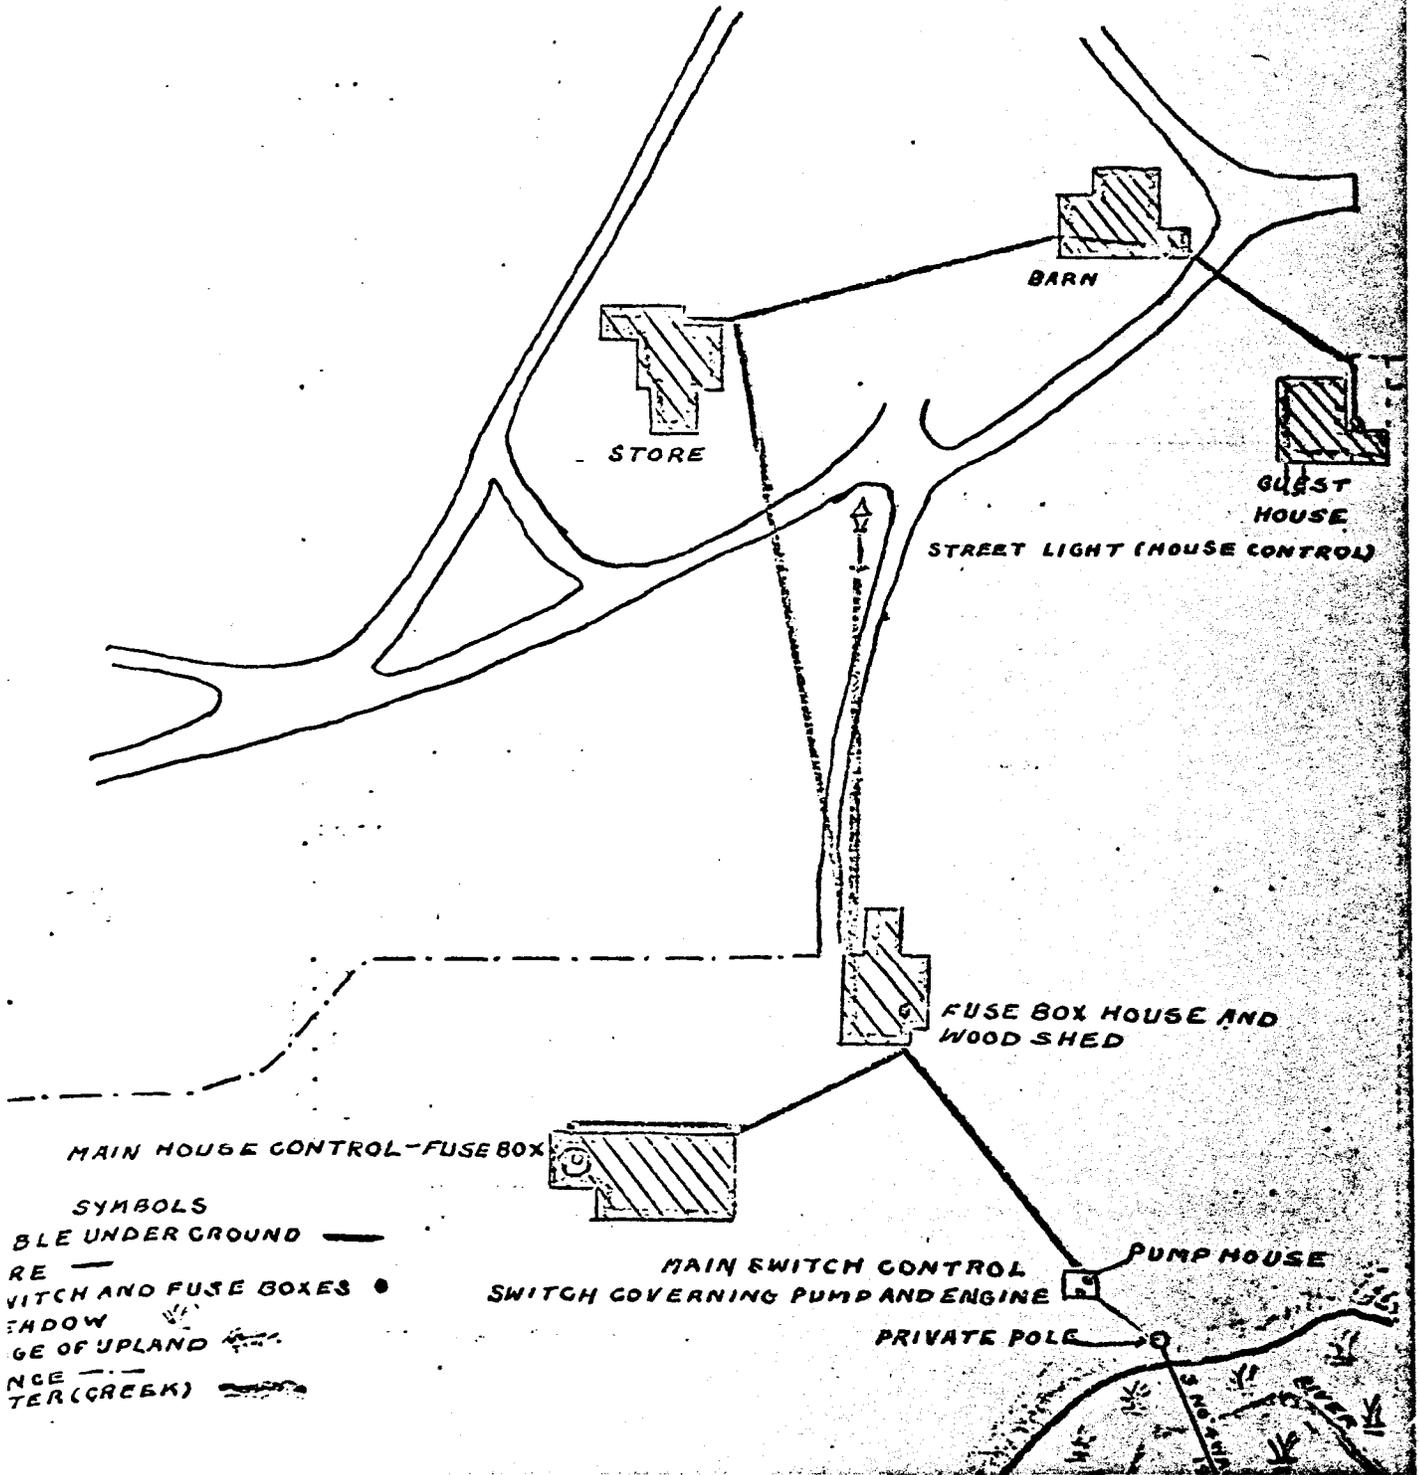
Atwood-Higgins House: Plan of First Electrical Service.
